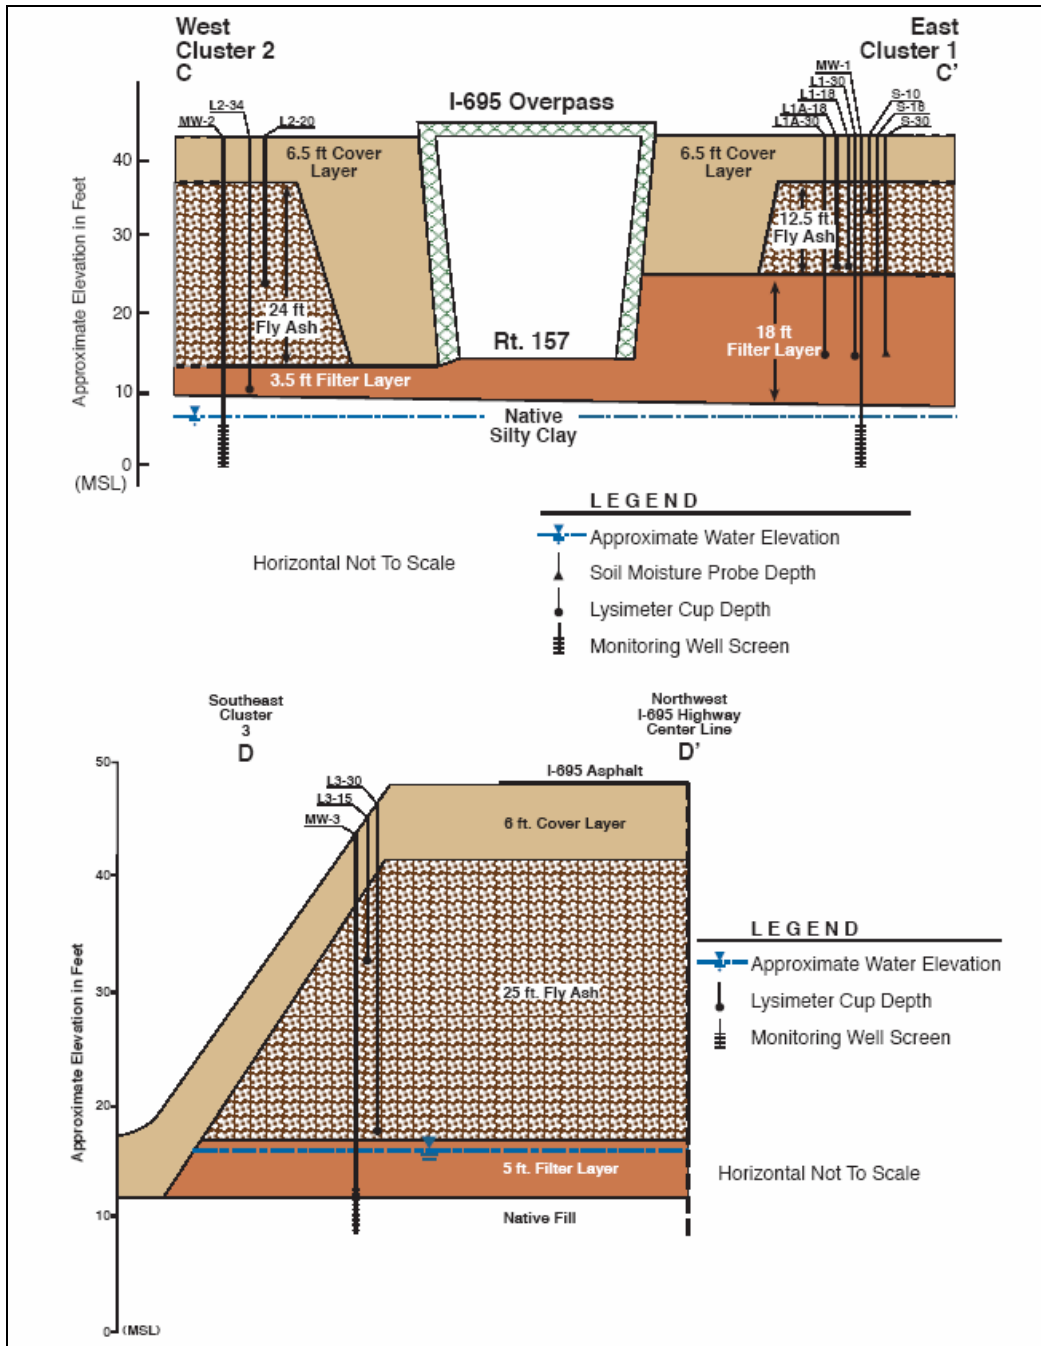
Schematic cross-sections of I-695 site (ERM, 2004).
